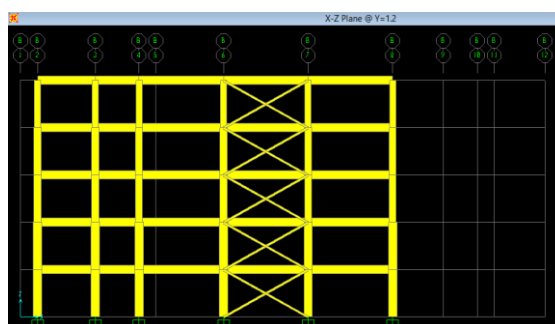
Modeling of steel bracing in direction XZ at Y=1.2 m
